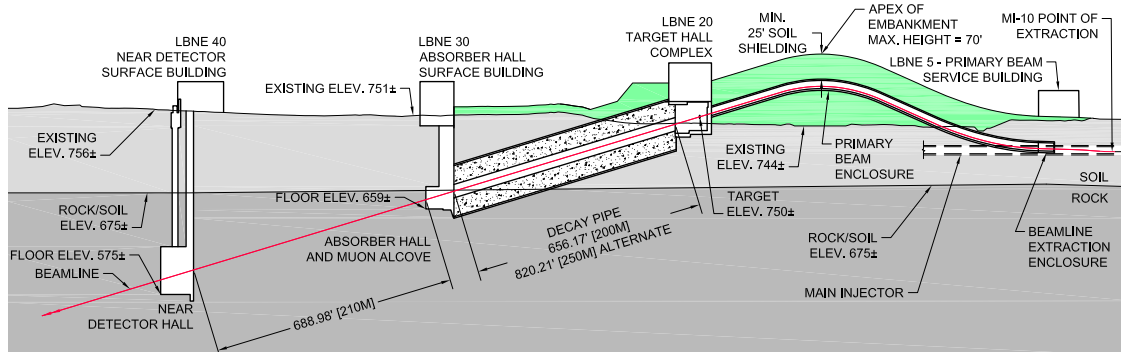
Elevation view showing the concept of elevating the beamline, thereby minimizing the amount of deep excavation and tunnels. The beam comes from the left through the primary beam enclosure and interacts at target within the Target Hall Complex. The green shaded part indicates fill used to elevate the beam.
